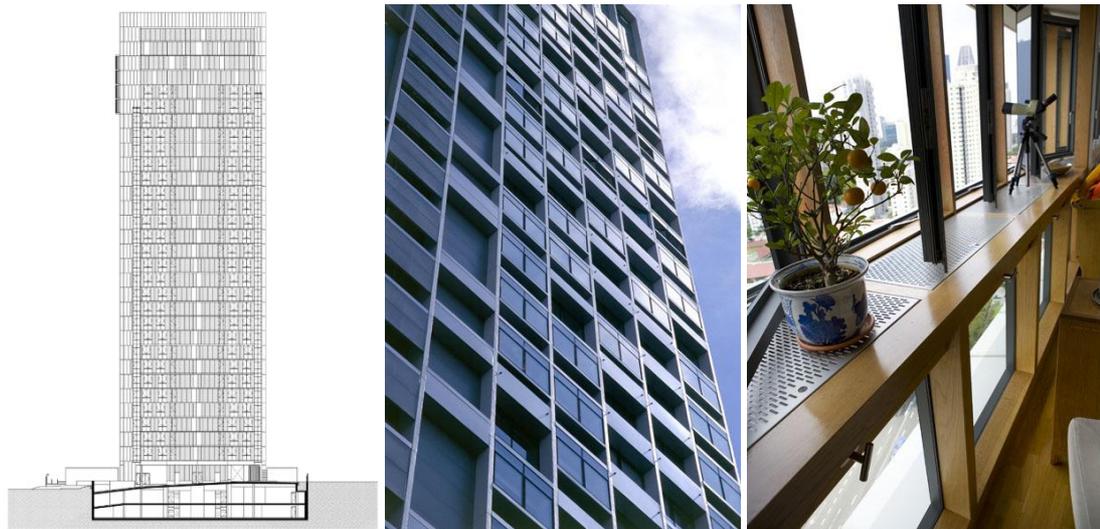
'Moulmein Rise' elevation and its 'Monsoon Window' details (Ali, 2007; Wong & Hassell, 2009)
